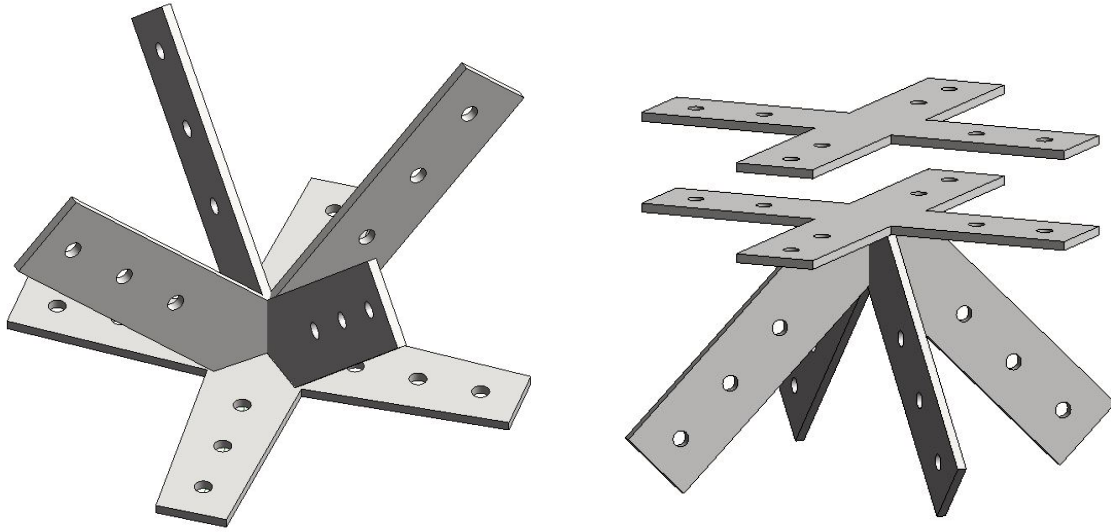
Steel connections of the truss structure: bottom nodes (left) and upper nodes (right).
